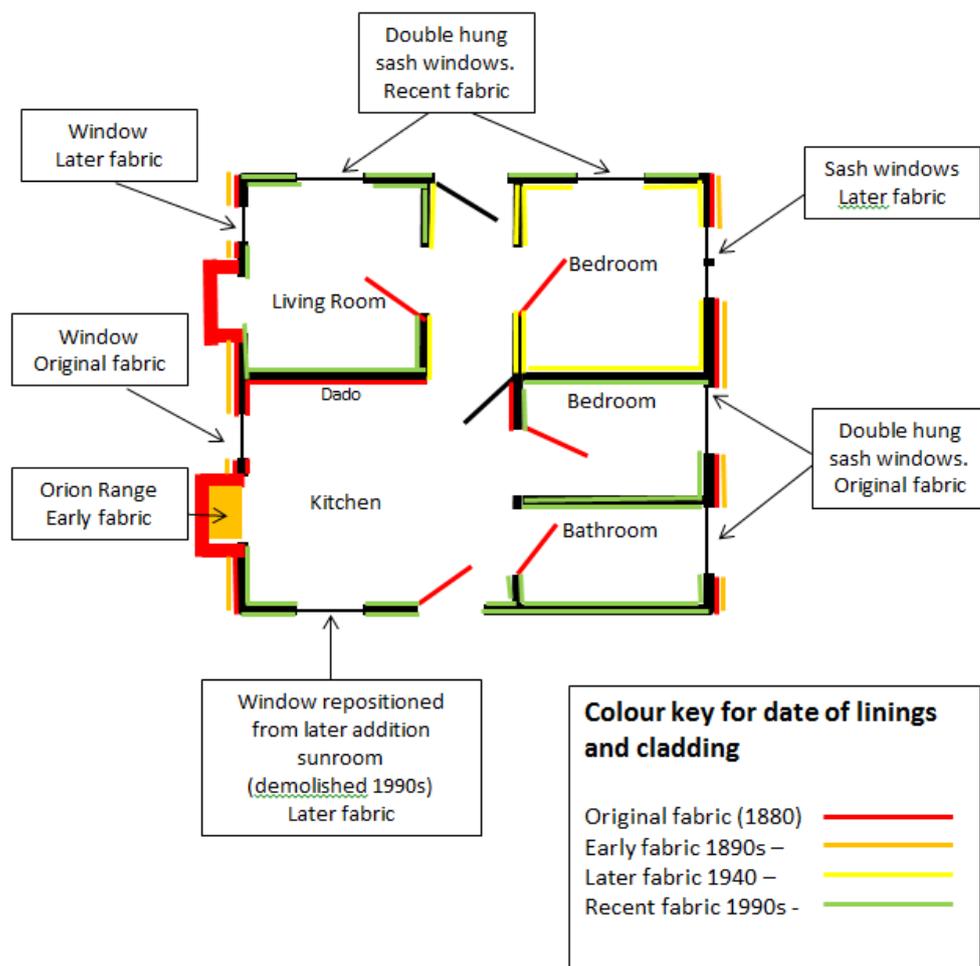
Sketch plan of building fabric (Jonathan Howard, Heritage New Zealand, 1 May 2017)
